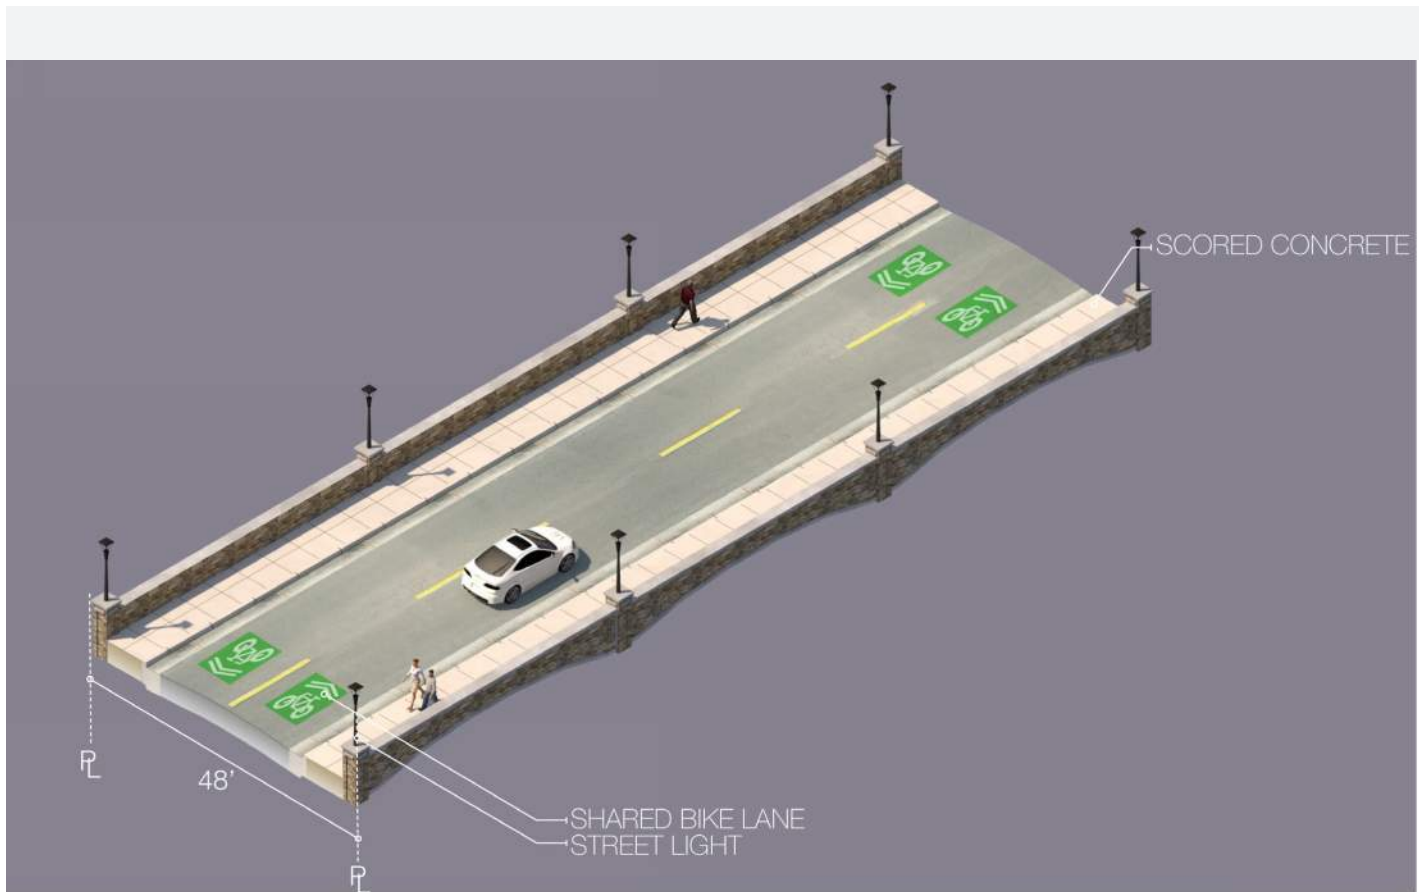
Street Axon – Altair Vista Culvert and A Street Bridge
